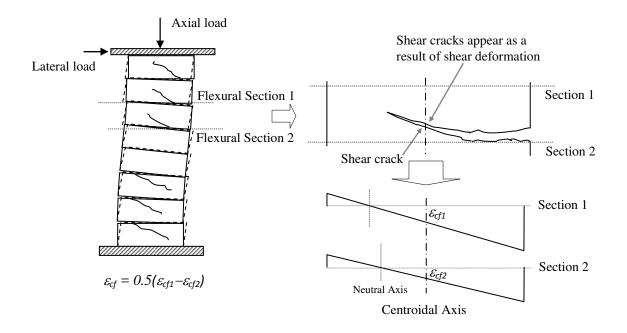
Effect of flexural deformation on shear crack widening in a reinforced concrete column.
